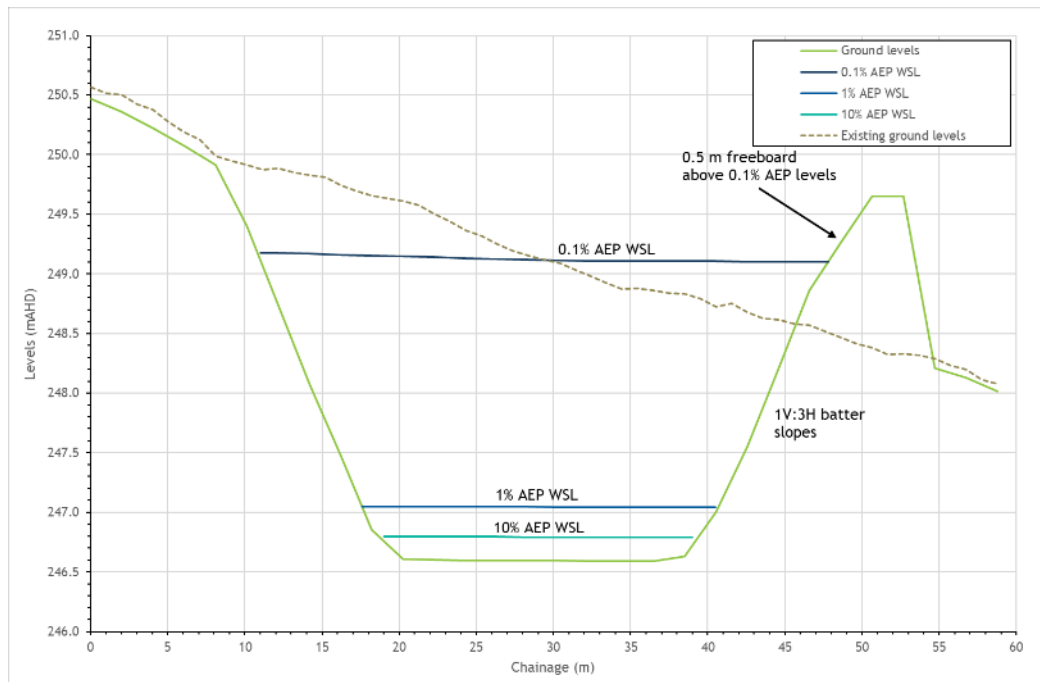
Typical cross section (XS1 in Figure 8.3) of proposed northern diversion drain around Jupiter Pit
